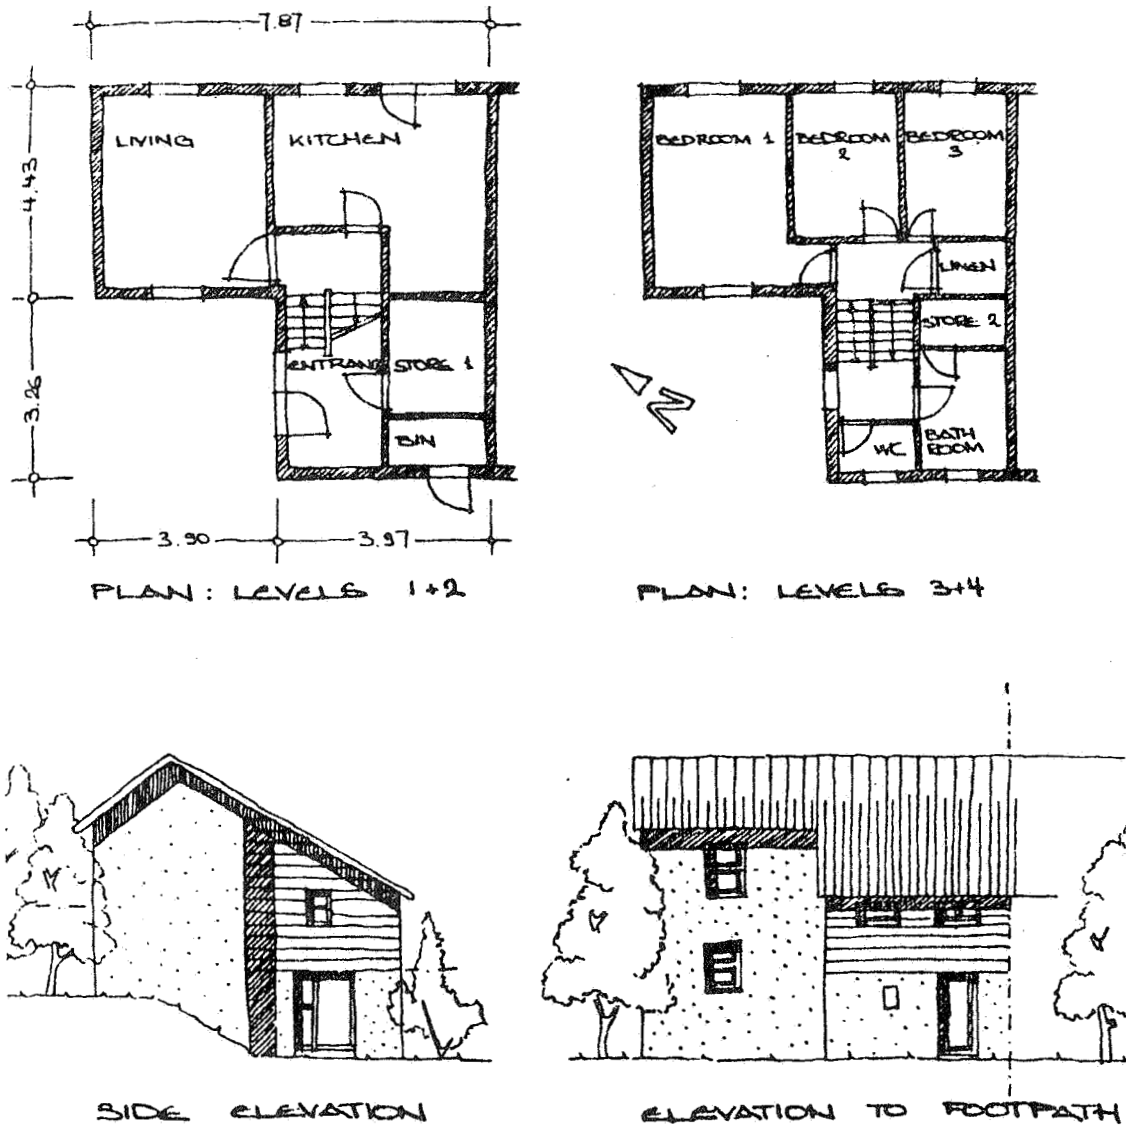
ABERTRIDWR HOUSE - PLAN AND ELEVATION
